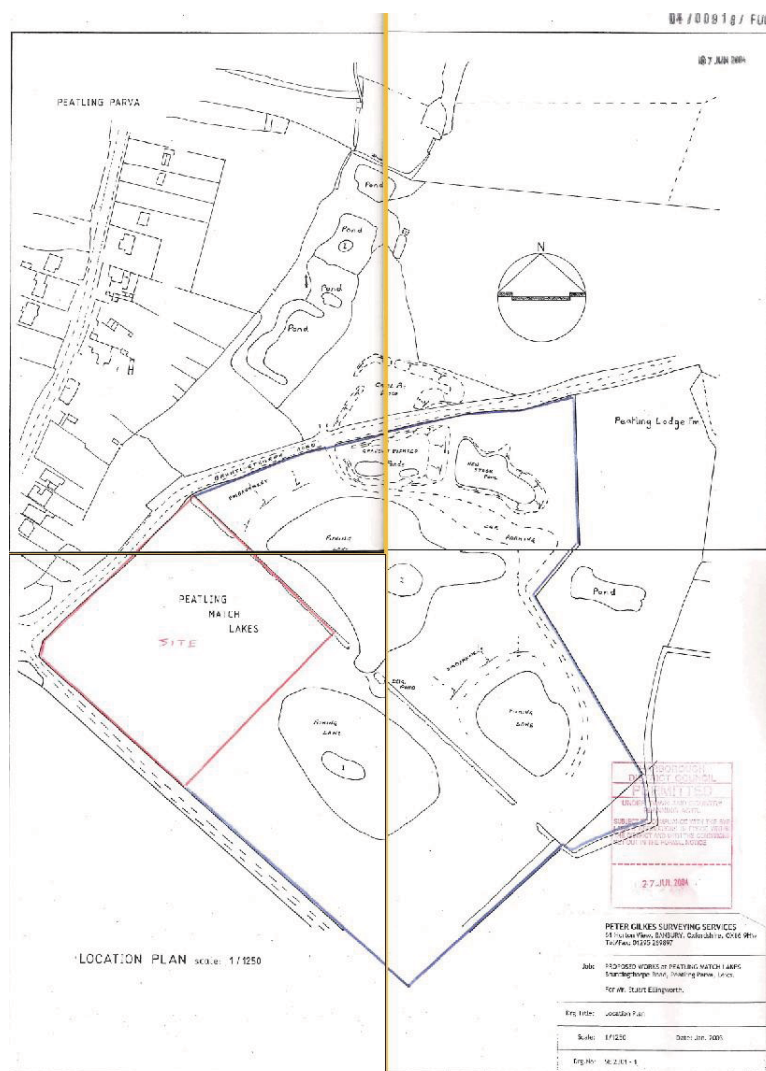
site plan (reproduced from plans supplied by Planters (Leicester) Ltd)
